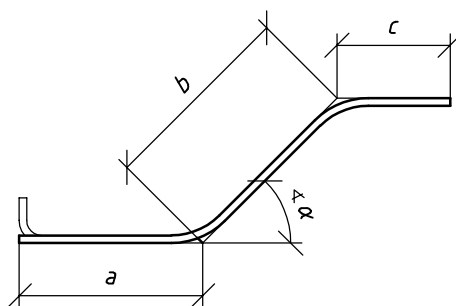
Bending dimensions — Shape code 99 (non-standard example)
